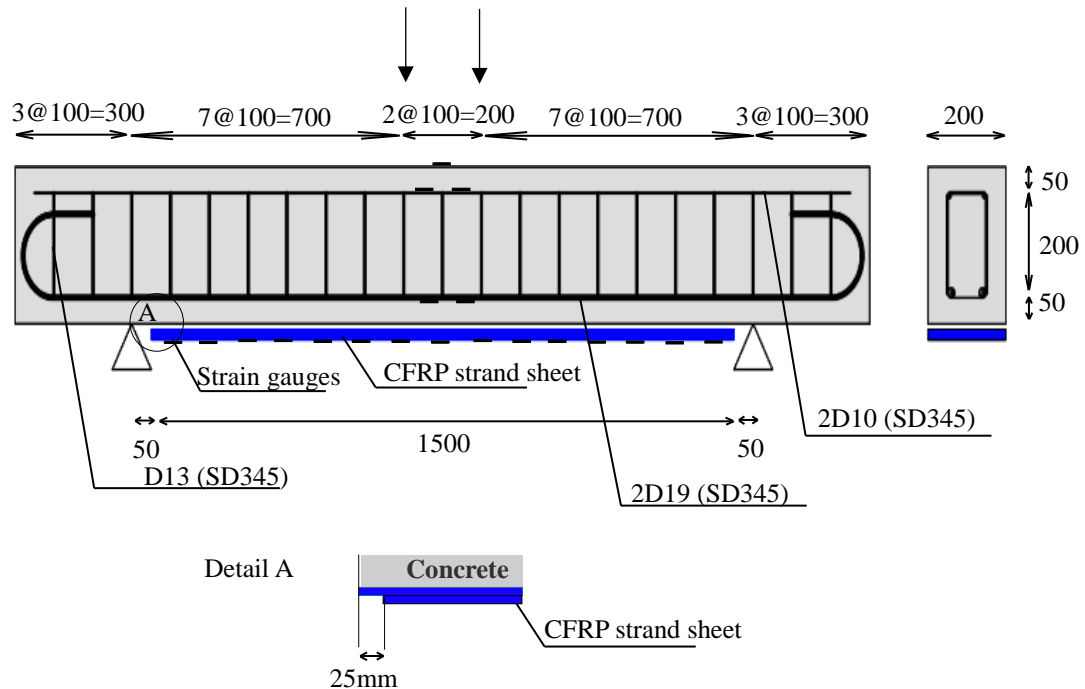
Cross section of CFRP strand sheet strengthened RC beams
